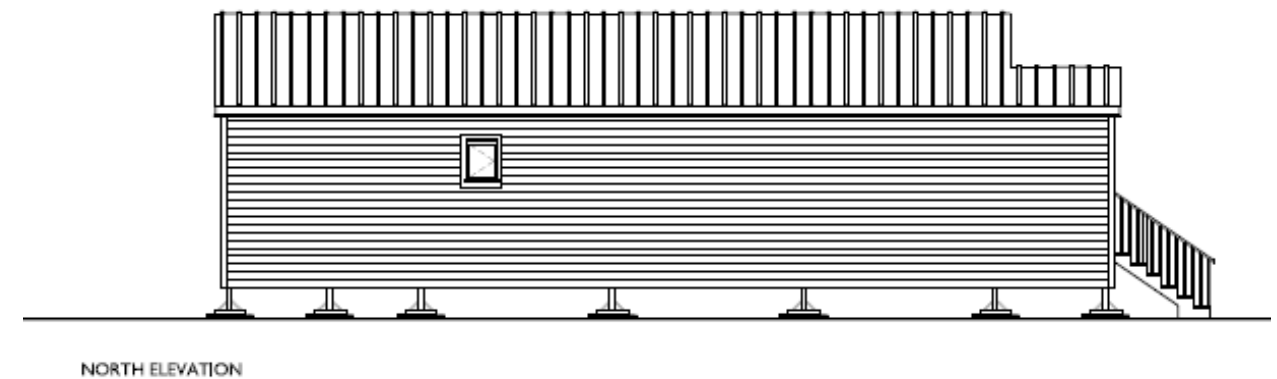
North Elevation of the Arviat Northern Sustainable House (Semple, 2007)
